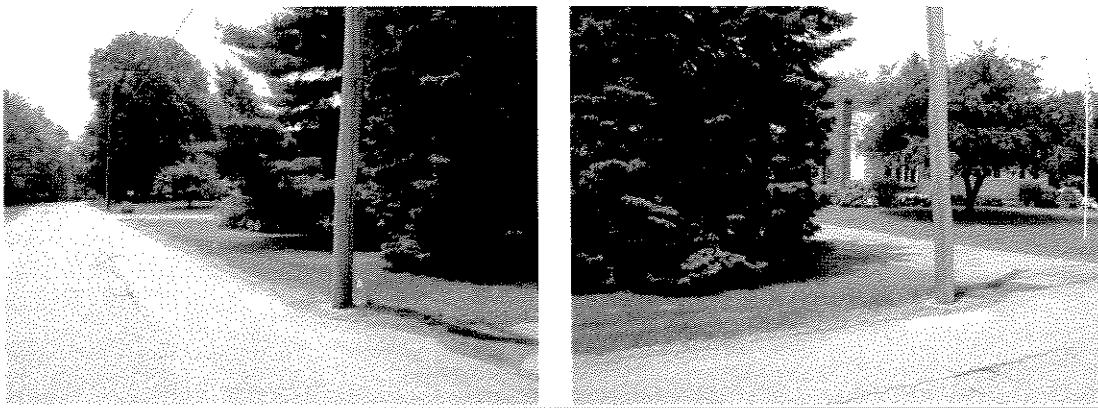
UP #6 - Wood Lane - between house #41 & #49
